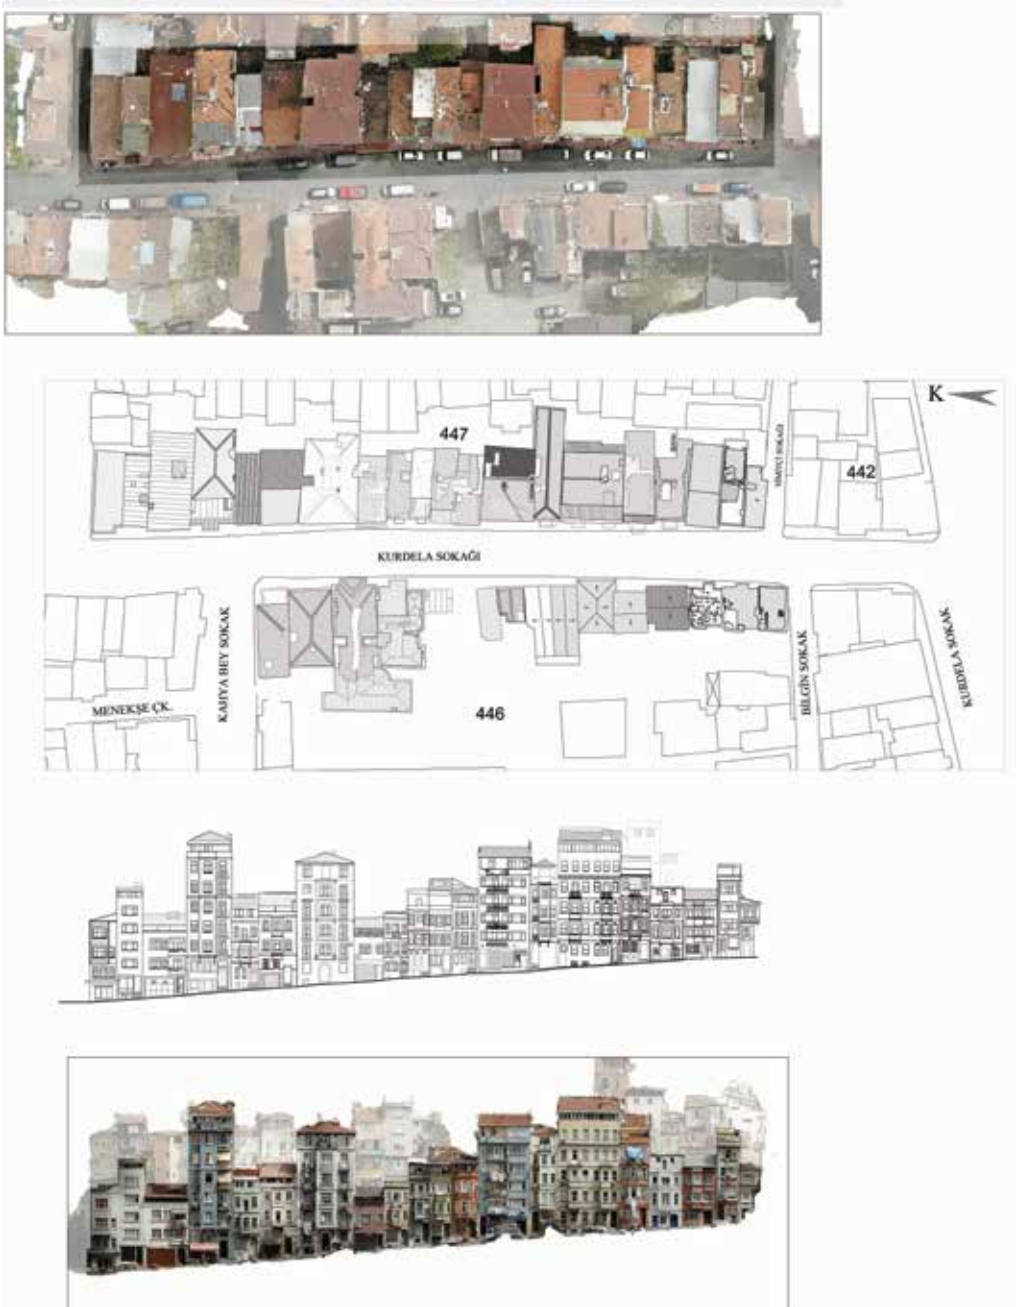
Survey of Kurdela Street, building block 447 eastern façade, with roof plan and silhouette as orthophotos and CAD drawings, conducted by a group of graduate students: Serkan Akın, Ayşenur Yelda Can, Ayberk Soyyiğit, Beyza Hilal Altunışık, Rumeysa Yıldıztaş, İmen Ben Saber, and Talha Mertel in July 2021
